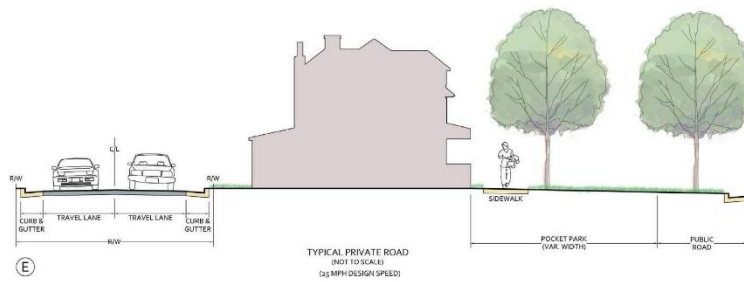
PRIVATE STREET CROSS SECTION FOR AMENITY ORIENTED LOTS
